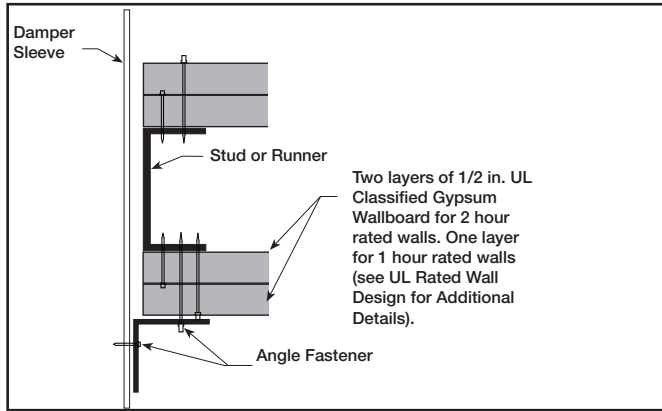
Single Side Angle With Steel Stud Wall - Angle Over Wallboard
